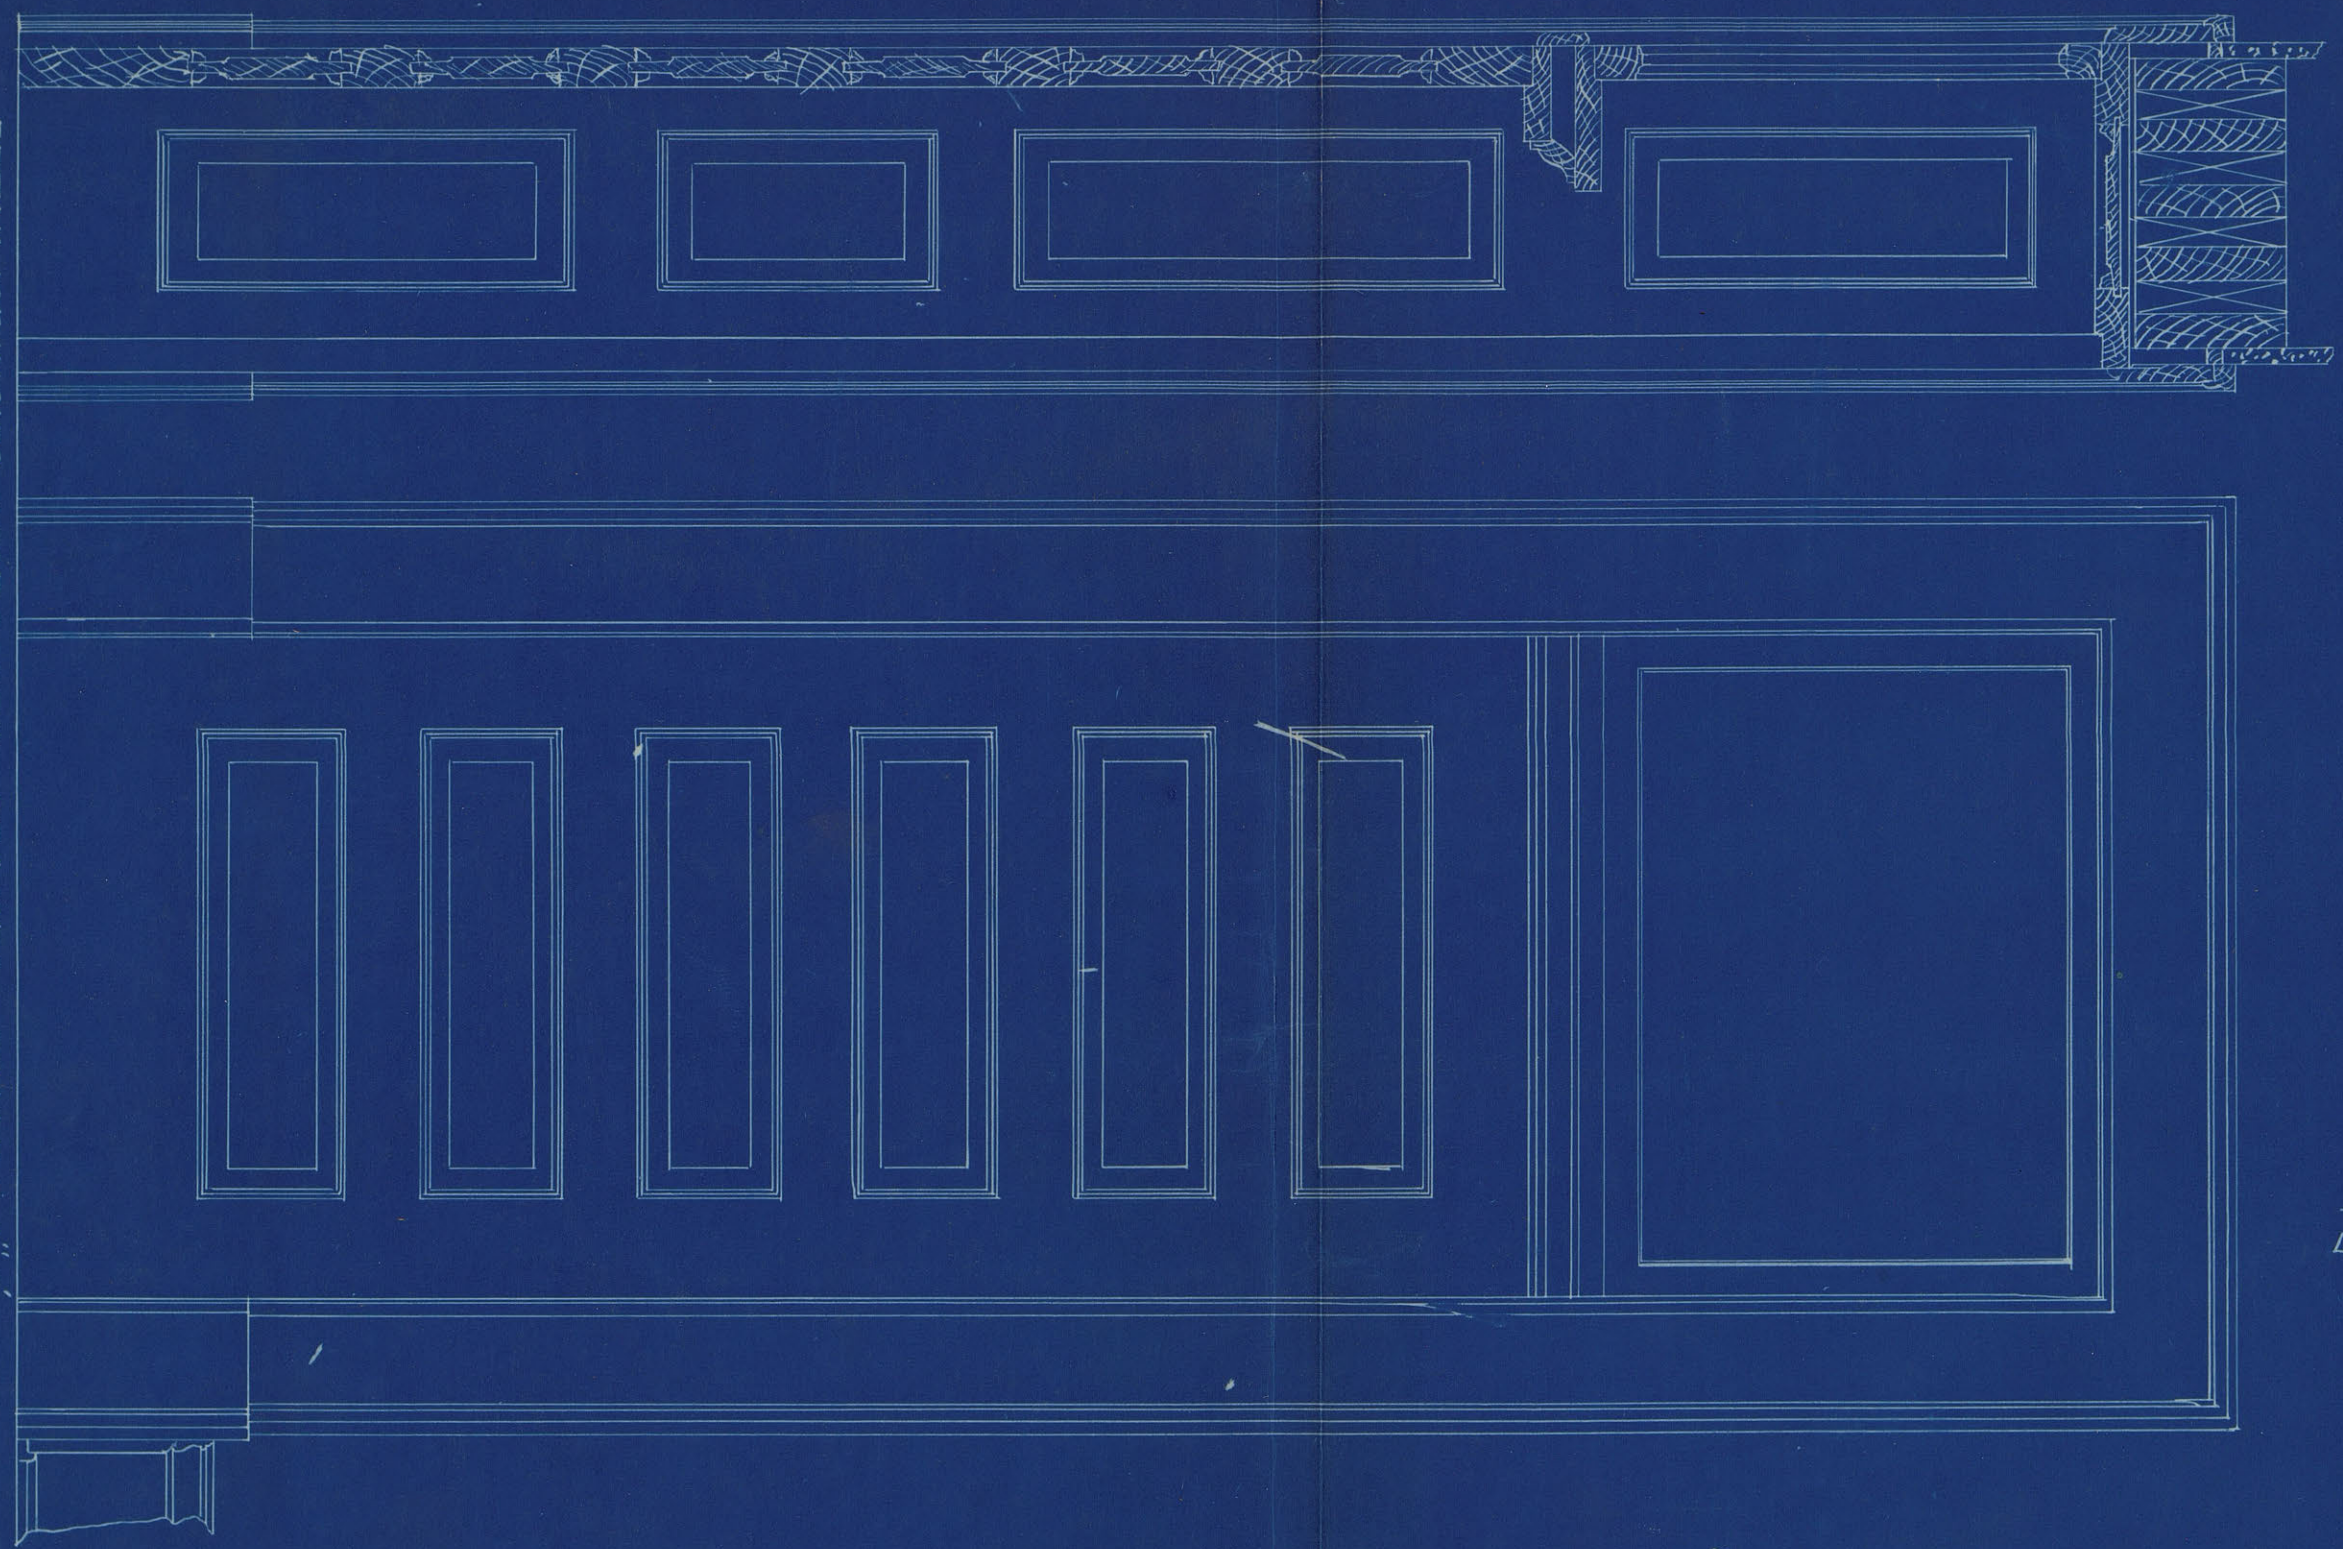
DETAIL OF WATER CLOSET STALLS 3/4"=1'
